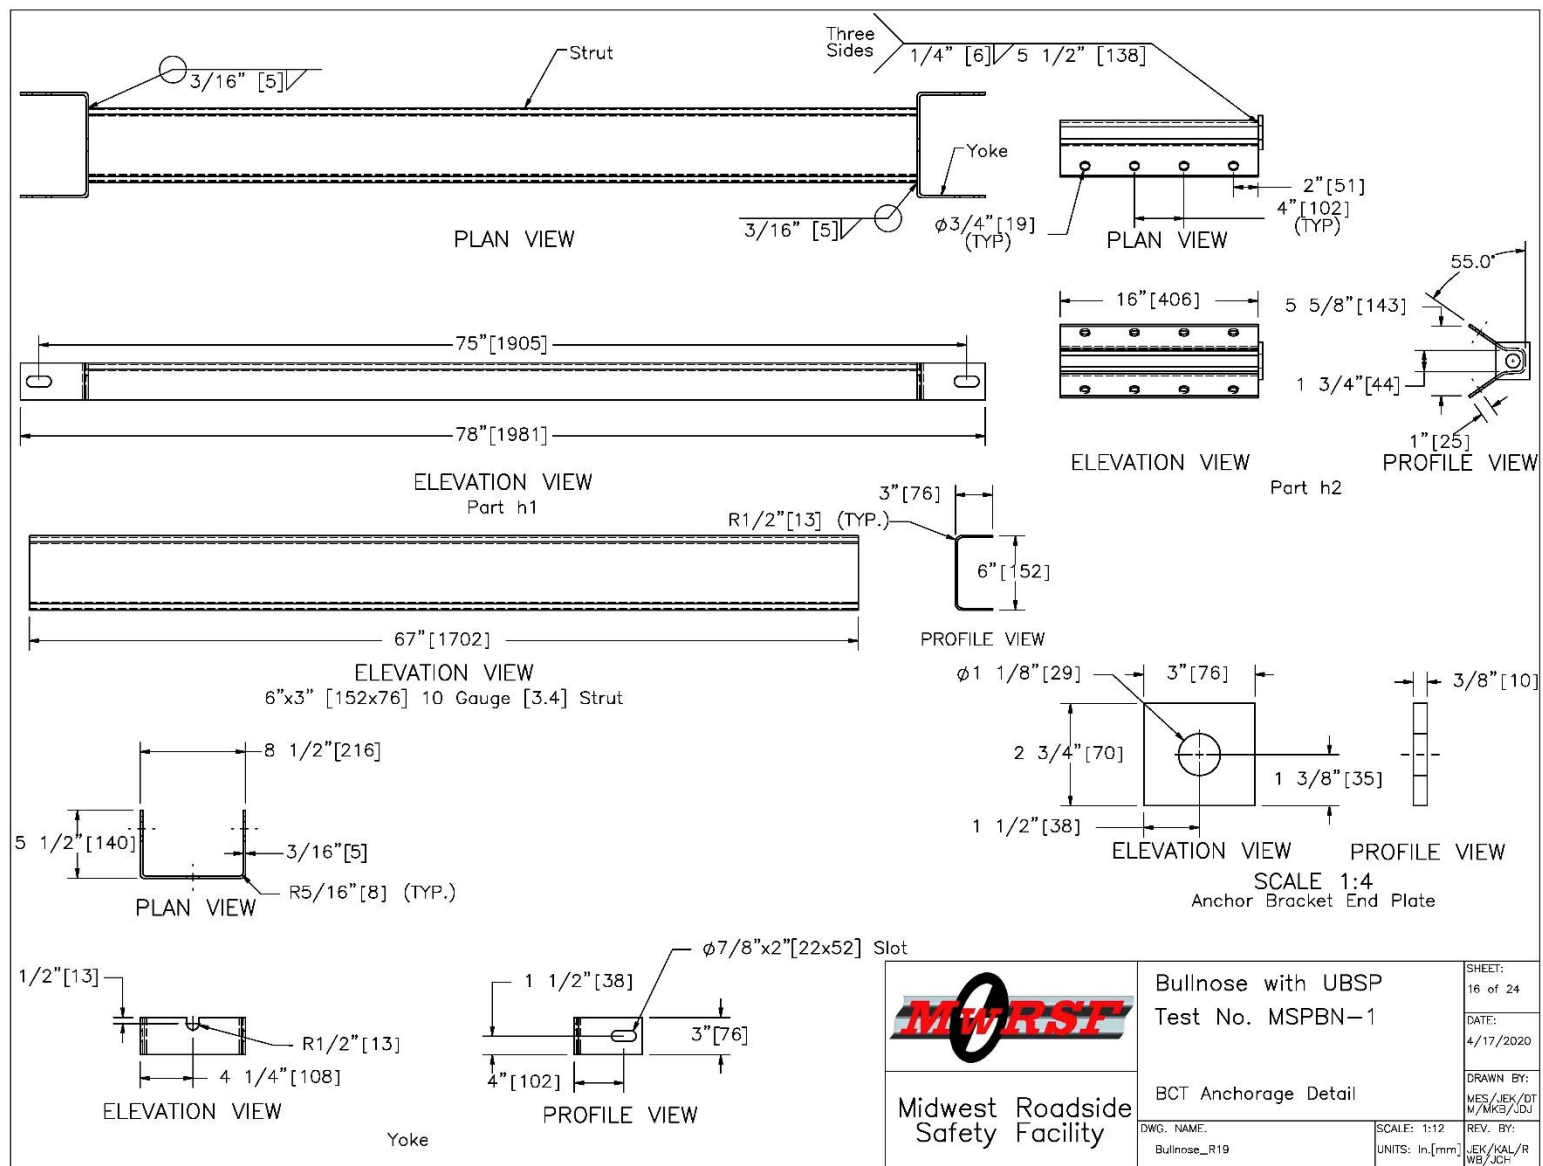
BCT Anchorage Detail, Test Nos. MSPBN-1 through MSPBN-3
